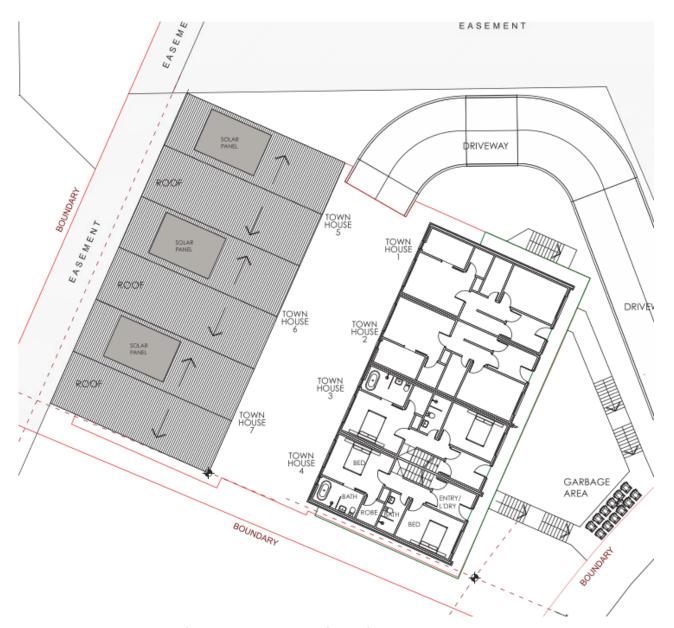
Ground Floor plan of Units 1, 2, 3 & 4 and Roof Plan of units 5, 6 & 7
